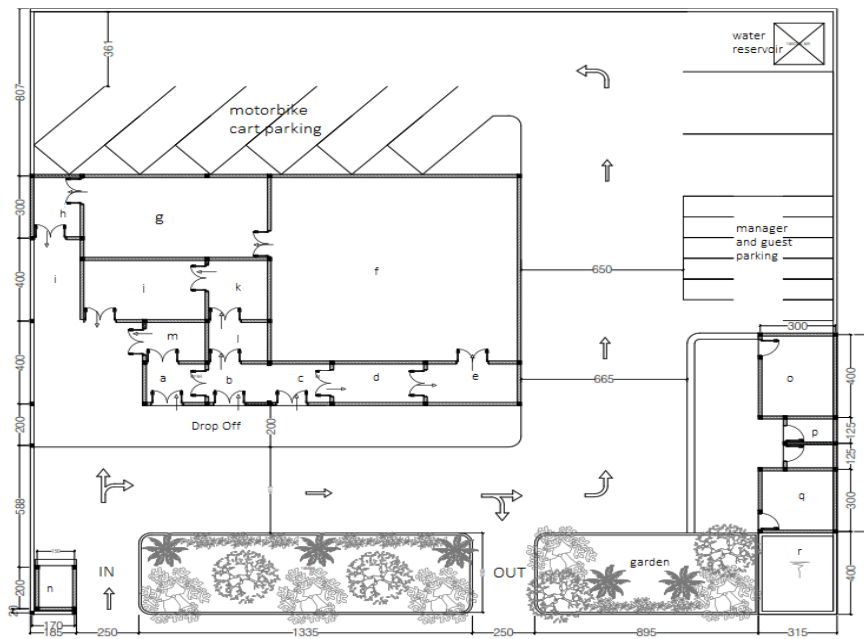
Planning for The TPS 3R Building Prototype (Siteplan)
